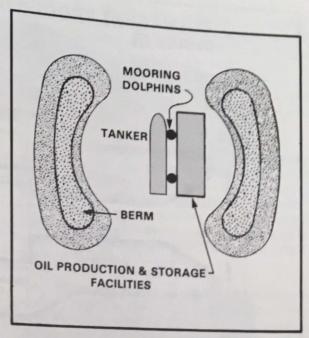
Within the harbour of an APLA, the Arctic tankers will moor at fixed mooring dolphins and crude oil will be transferred from storage facilities.
